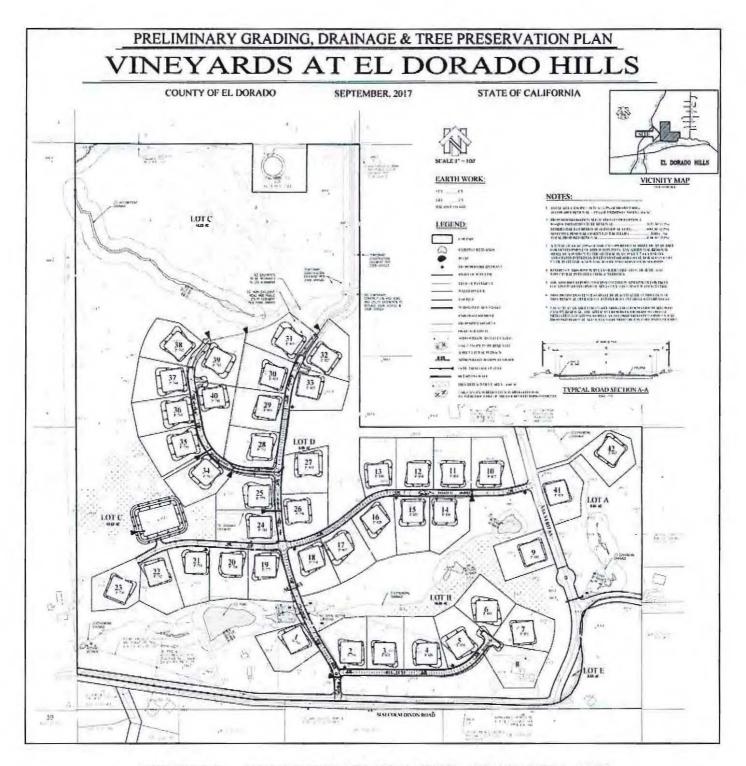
EXHIBIT F – PRELIMINARY GRADING, DRAINAGE, AND TREE PRESERVATION PLAN (SEPTEMBER 2017)
